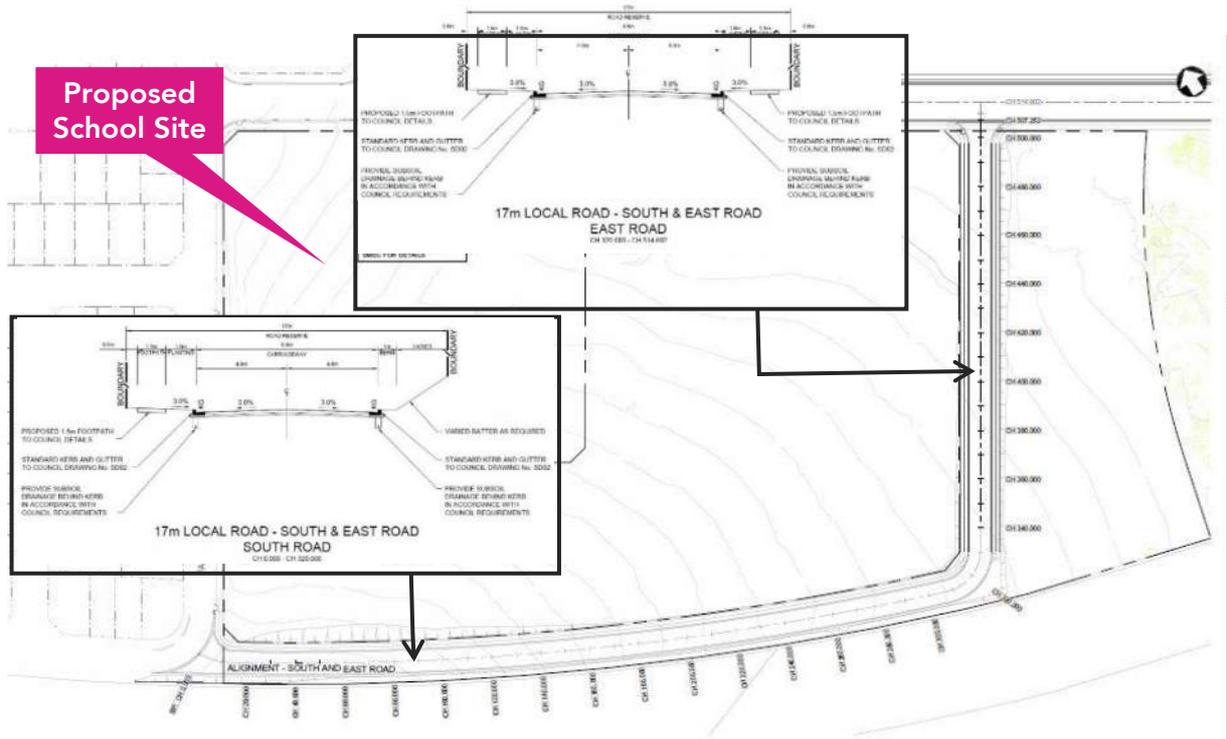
The South-East Road – Faulkner Way towards Parkway Avenue
